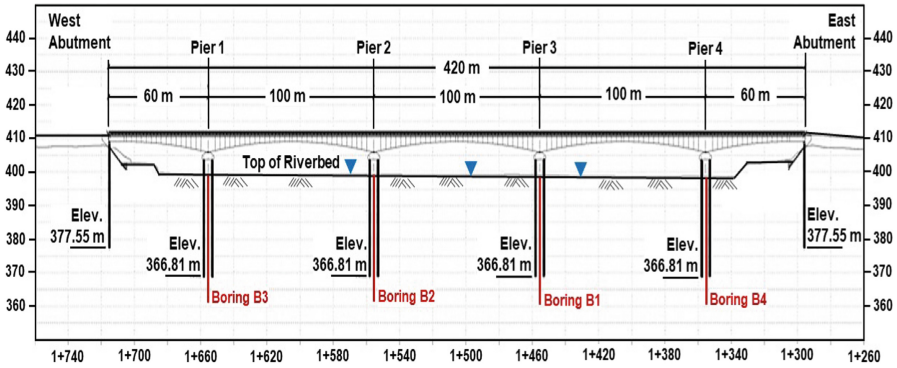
Elevation profile of the bridge super- and substructure and approximate boring locations
